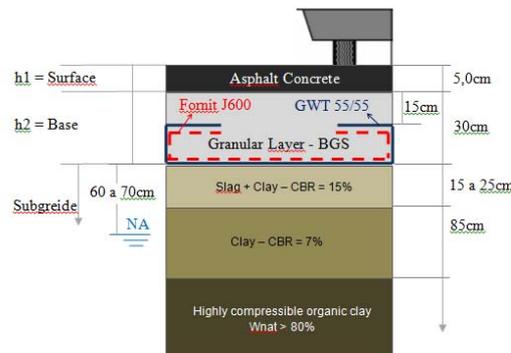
Section of flexible pavement deployed. HMA = hot bituminous concrete and BGS = crushed stone graded.
